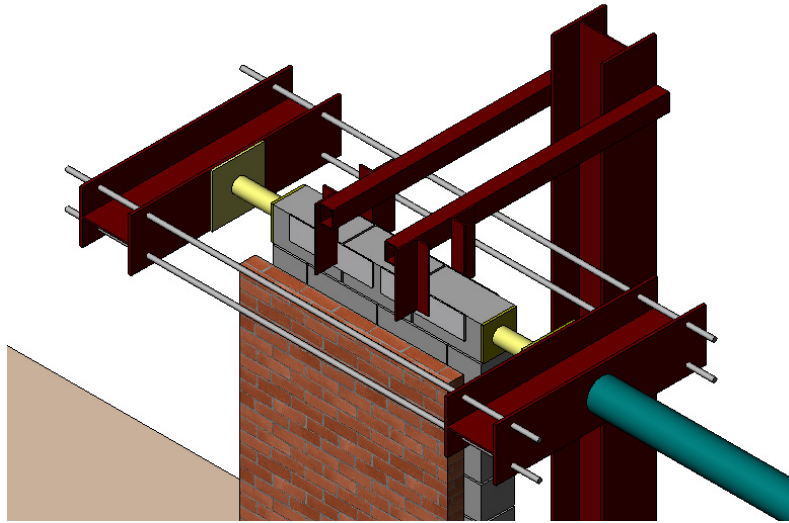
Illustration of loading beam and out-of-plane support components of in-plane loading system
